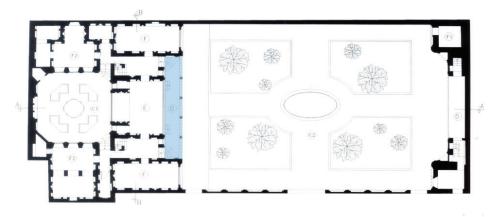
Traditional house plan with riwaq (1st Type), Behnam House [4]
